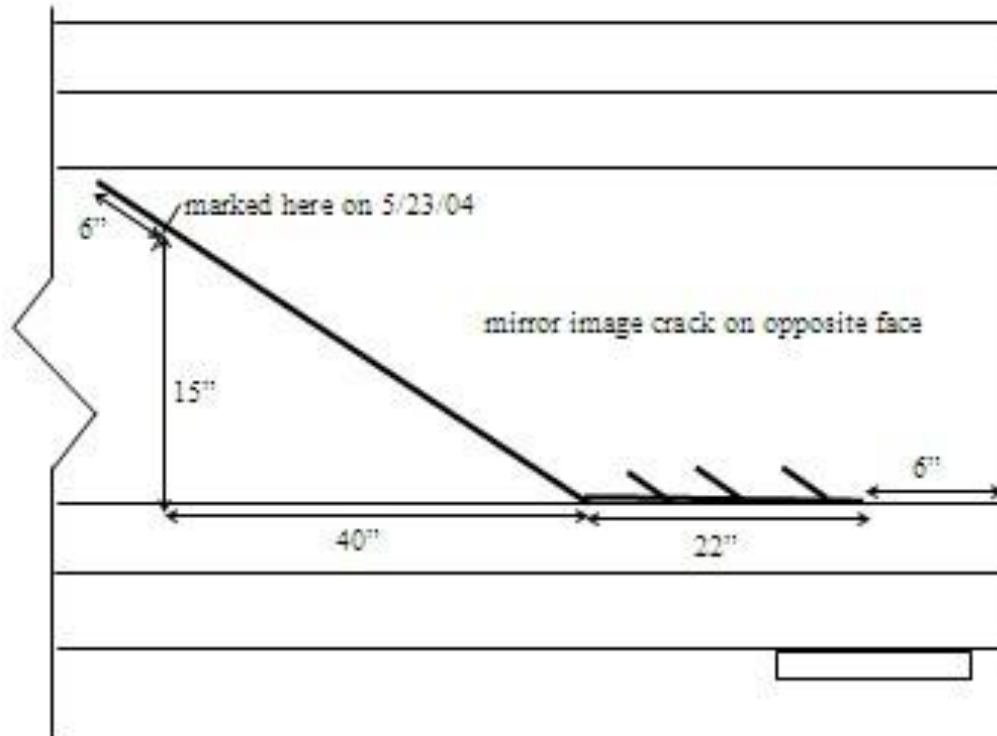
Crack diagram for Girder 5th from west side, west face, south abutment (#12693).
